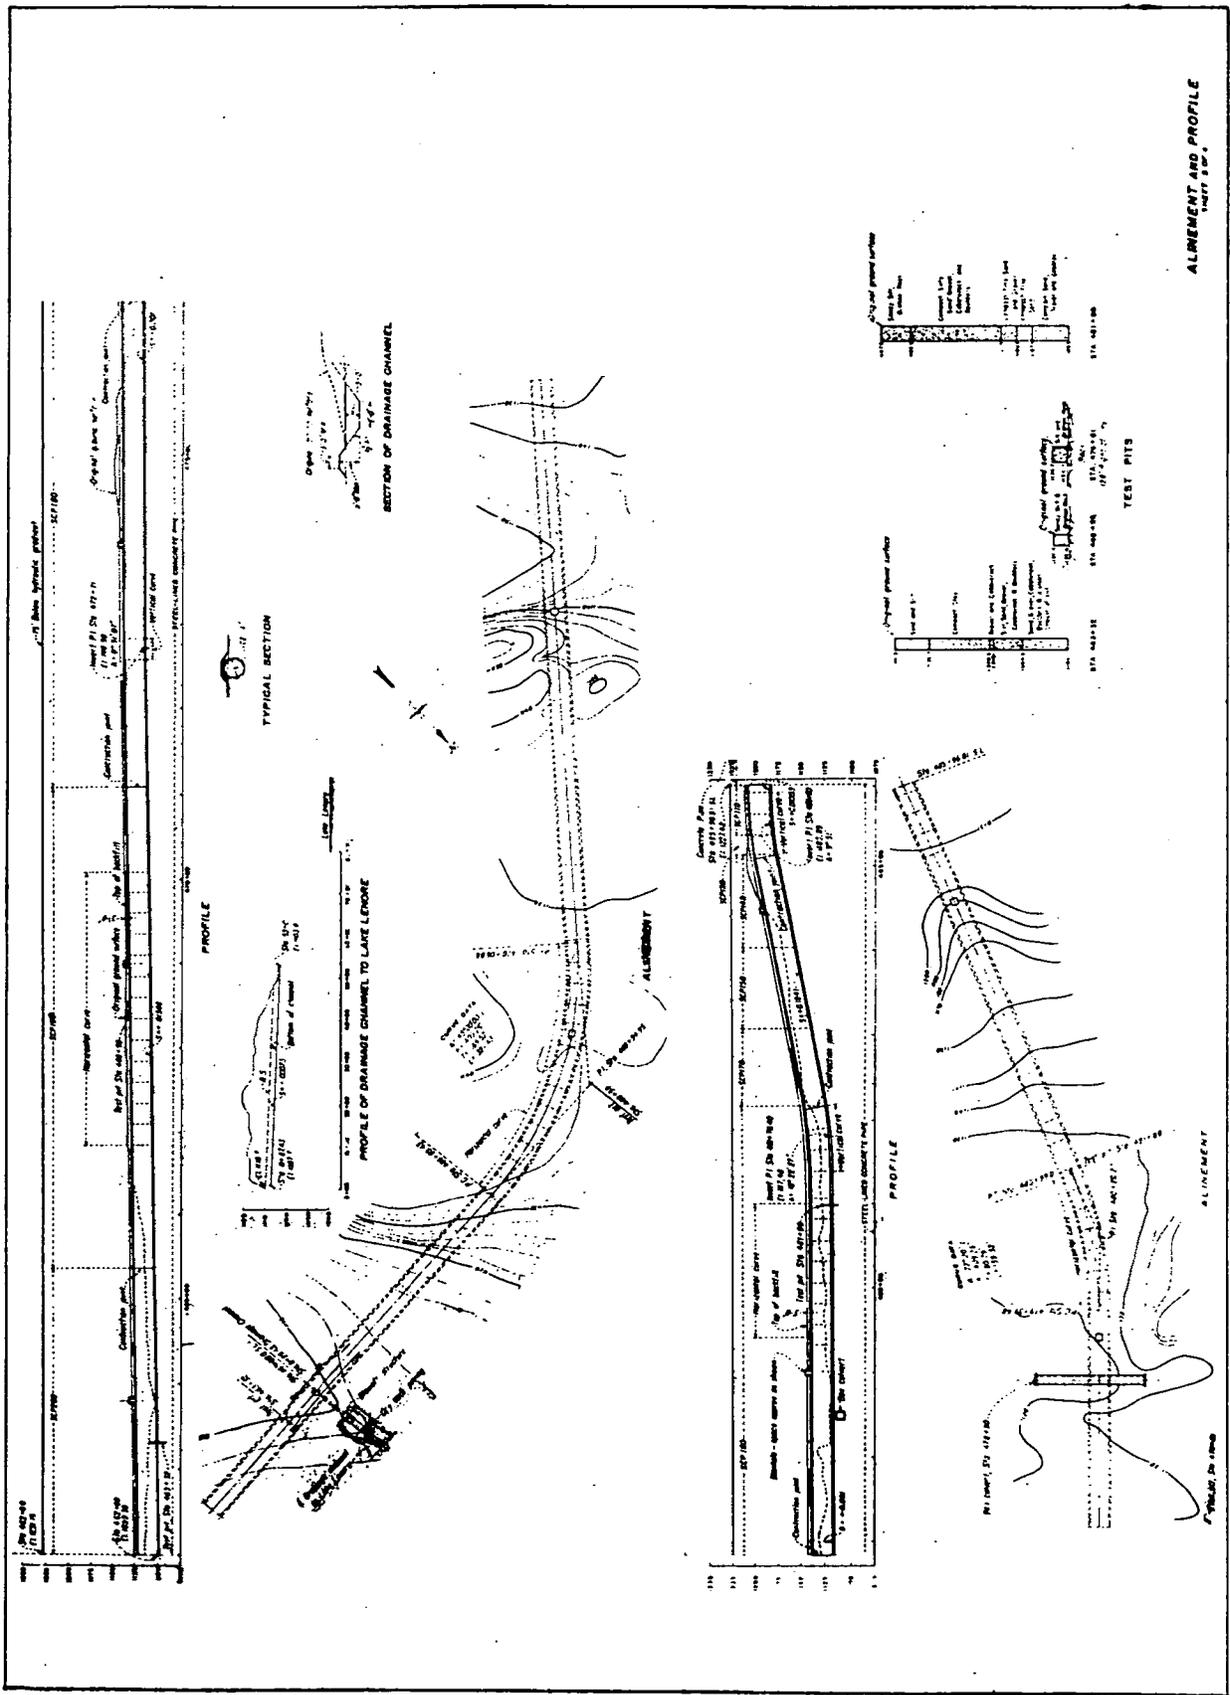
Alignment and profile of the steel-lined concrete pipe (Sheet 3).
